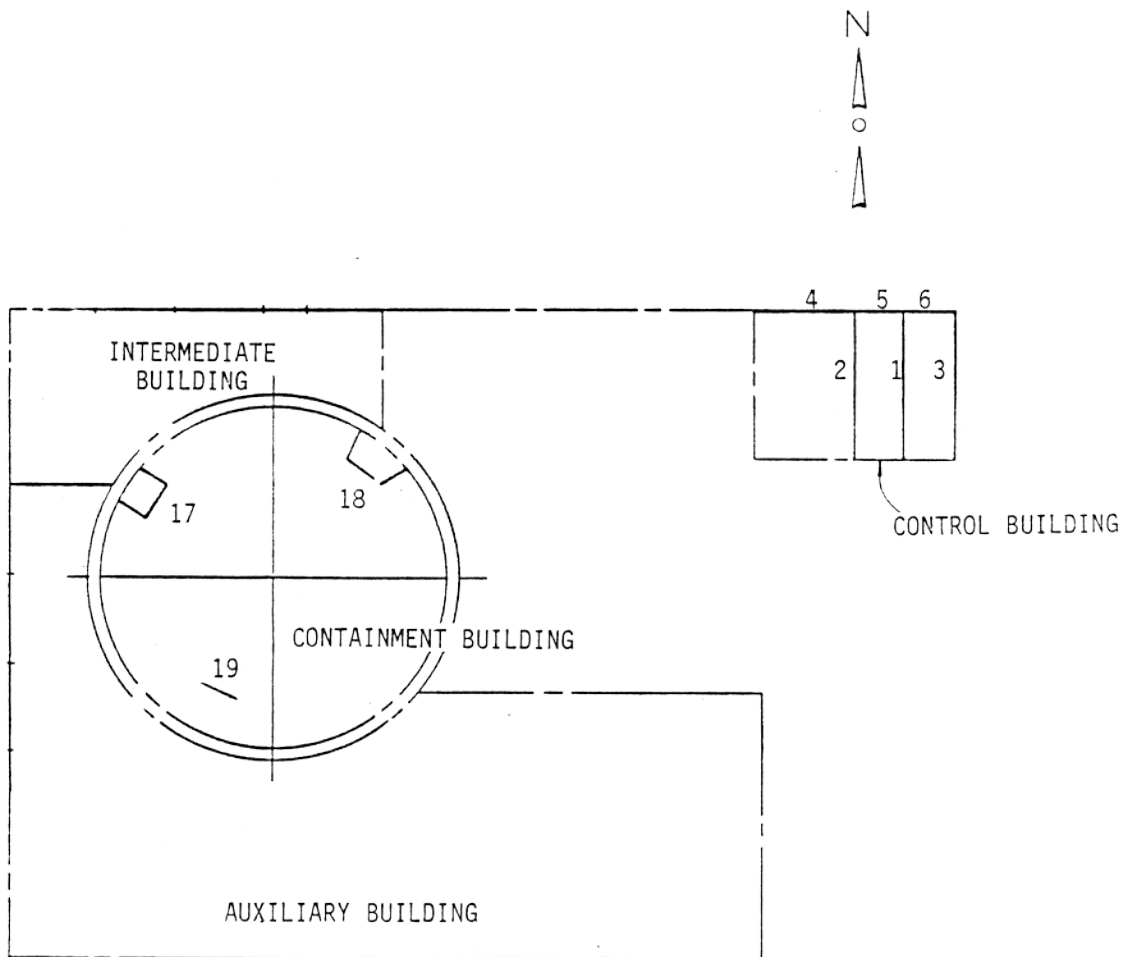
Masonry Wall Reevaluation, Wall Location Plan, Lower Levels
